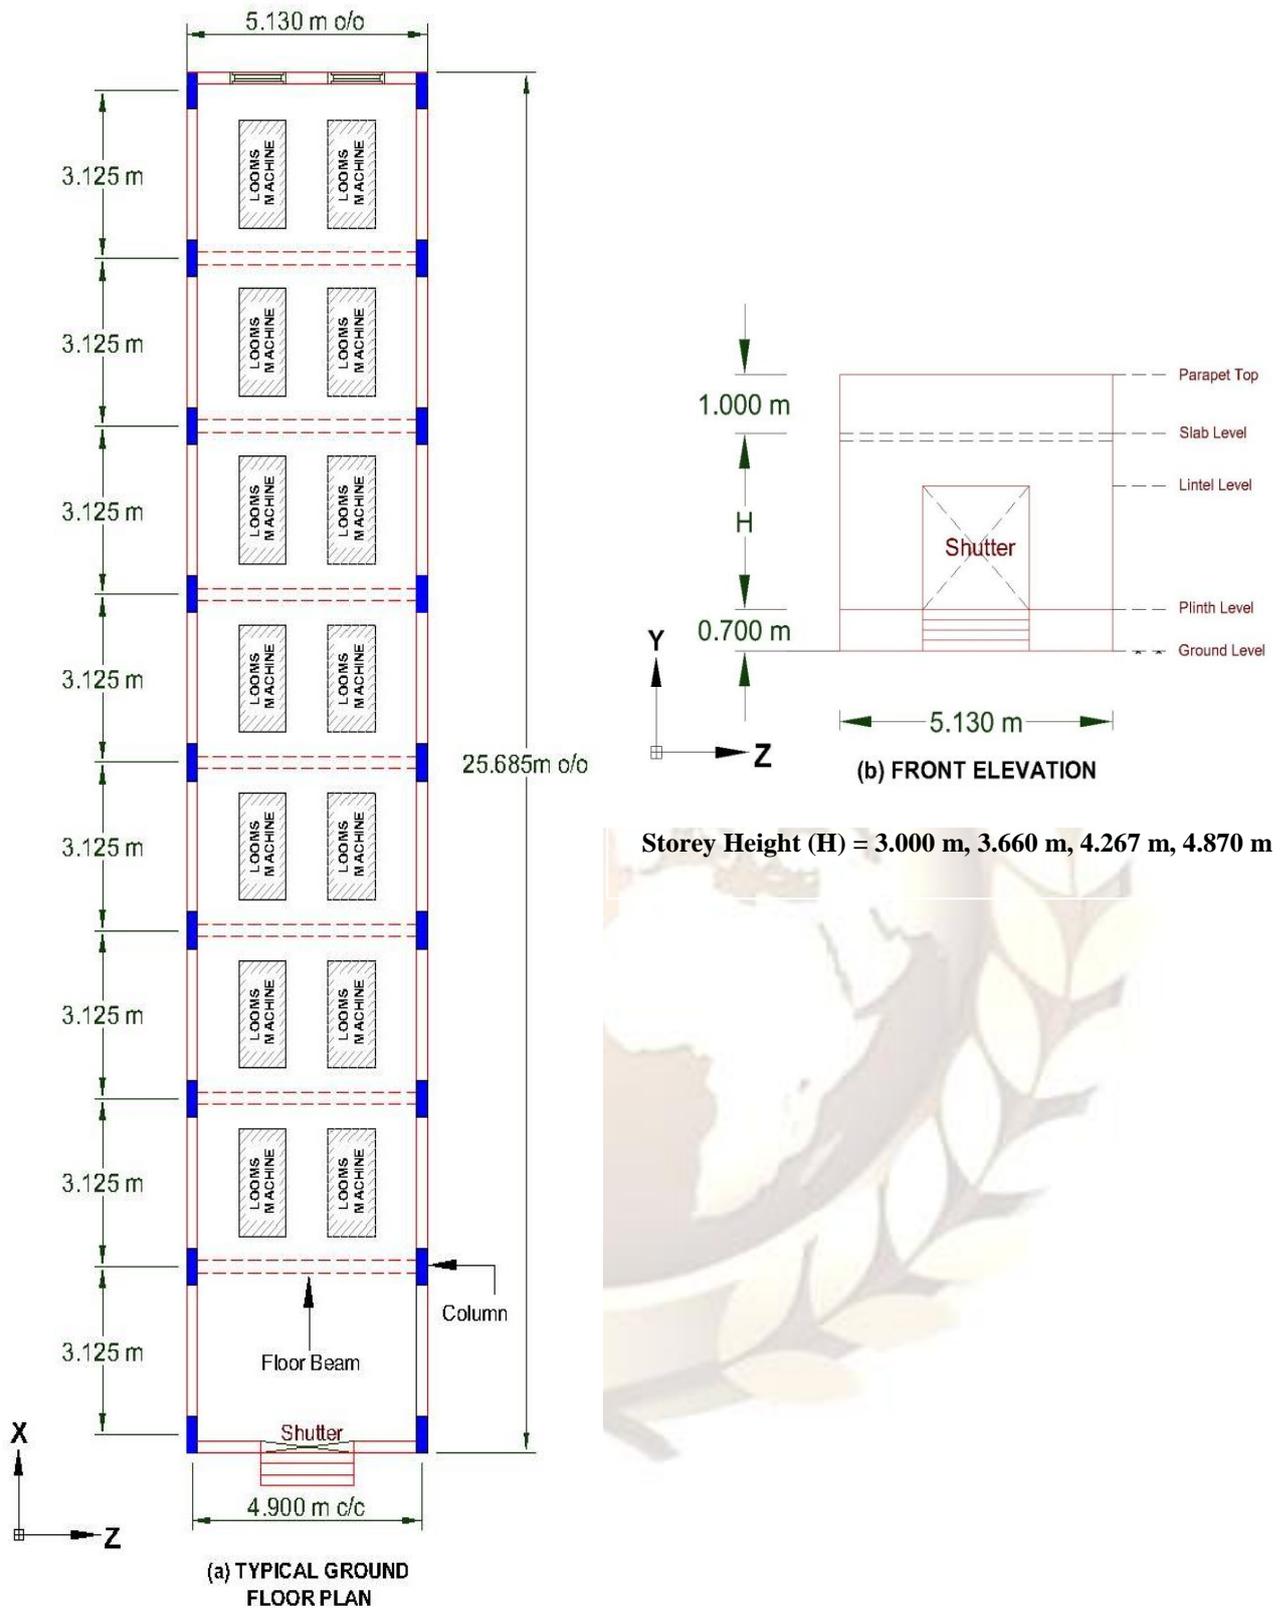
Typical Floor Plan of Looms Industry and its Front Elevation
